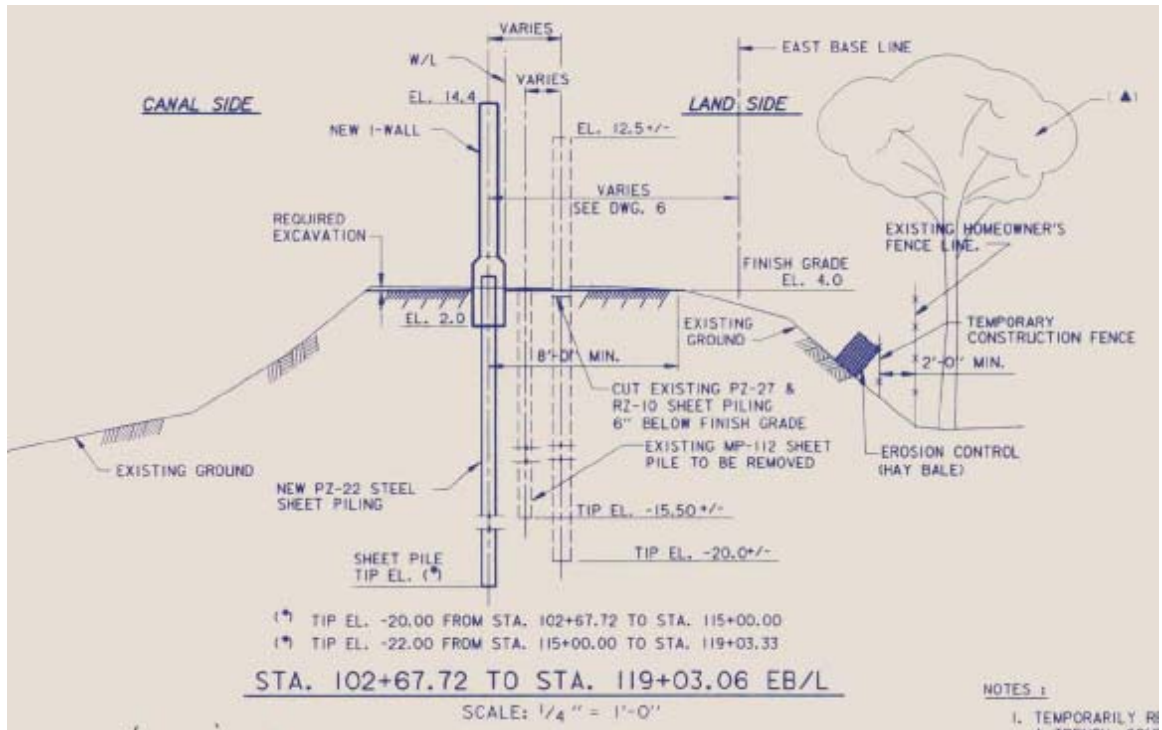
Section through I-wall (NGVD datum)
